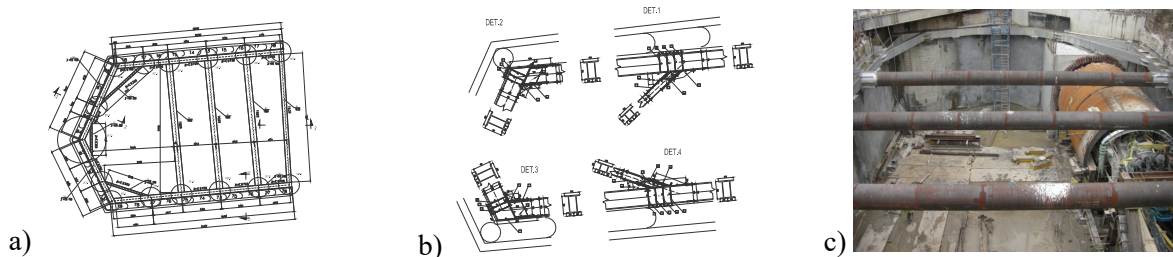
,b,c. Steel frame-a), Details for joints-b), View over the steel frame-c)
